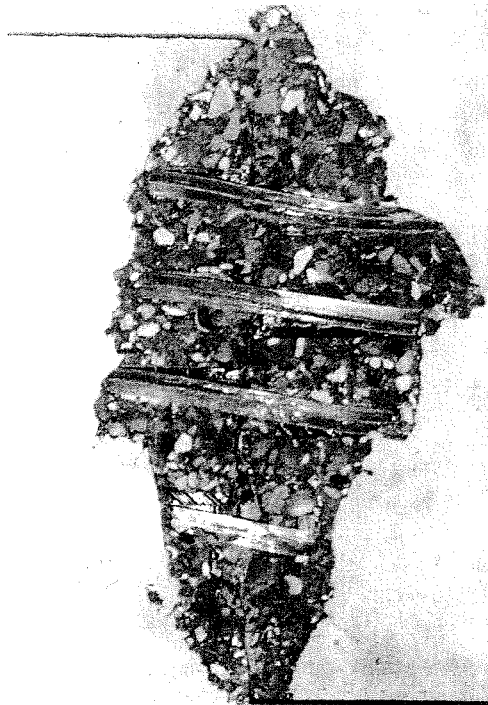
Final collapse state of 1% GFRP-reinforced specimen.
